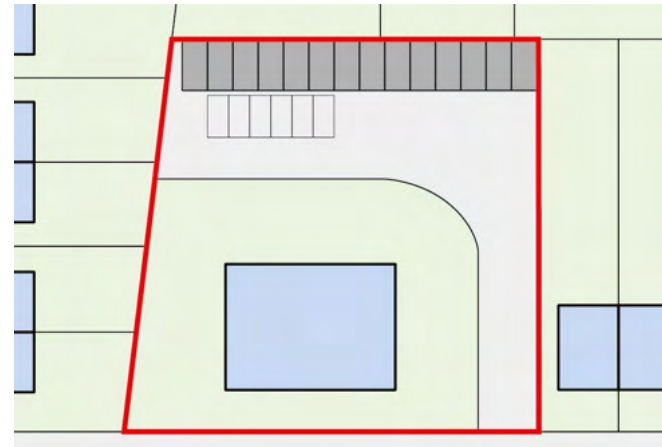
Pre-development scenario. Example backland site with existing garages and parking area.
